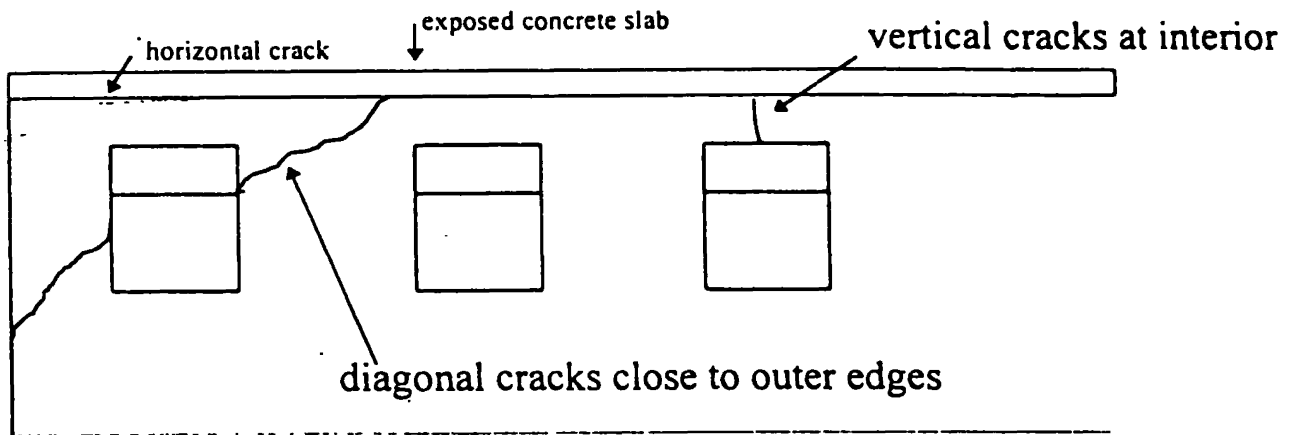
Vertical, horizontal and diagonal cracks in a load bearing wall supporting an exposed concrete slab.
